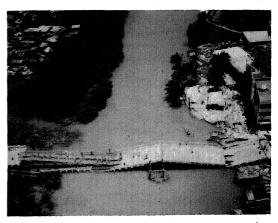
Magsaysay Bridge collapsed due to bearing failure and lateral ground spreading
